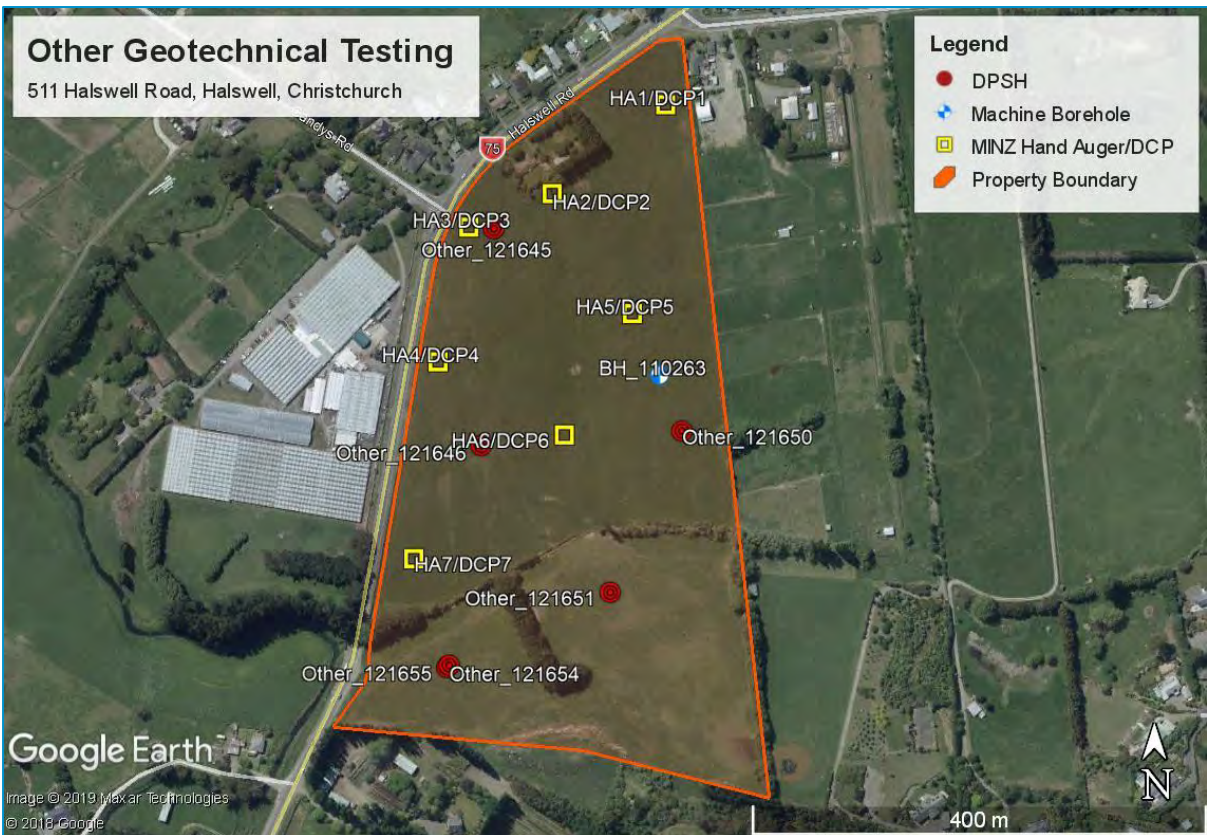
Other Geotechnical Investigation Location Plan (Scale as Shown)
